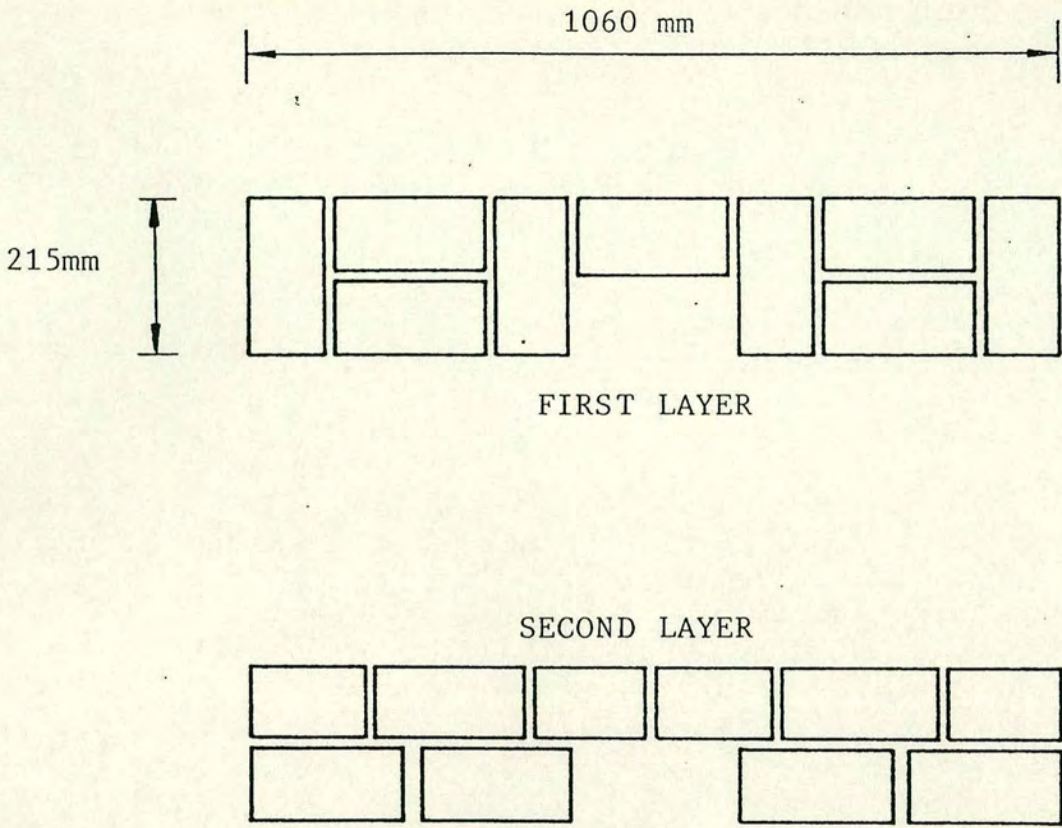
Flemish Garden bond beams cross-sections (B5-B6) (constructed in vertical position)
